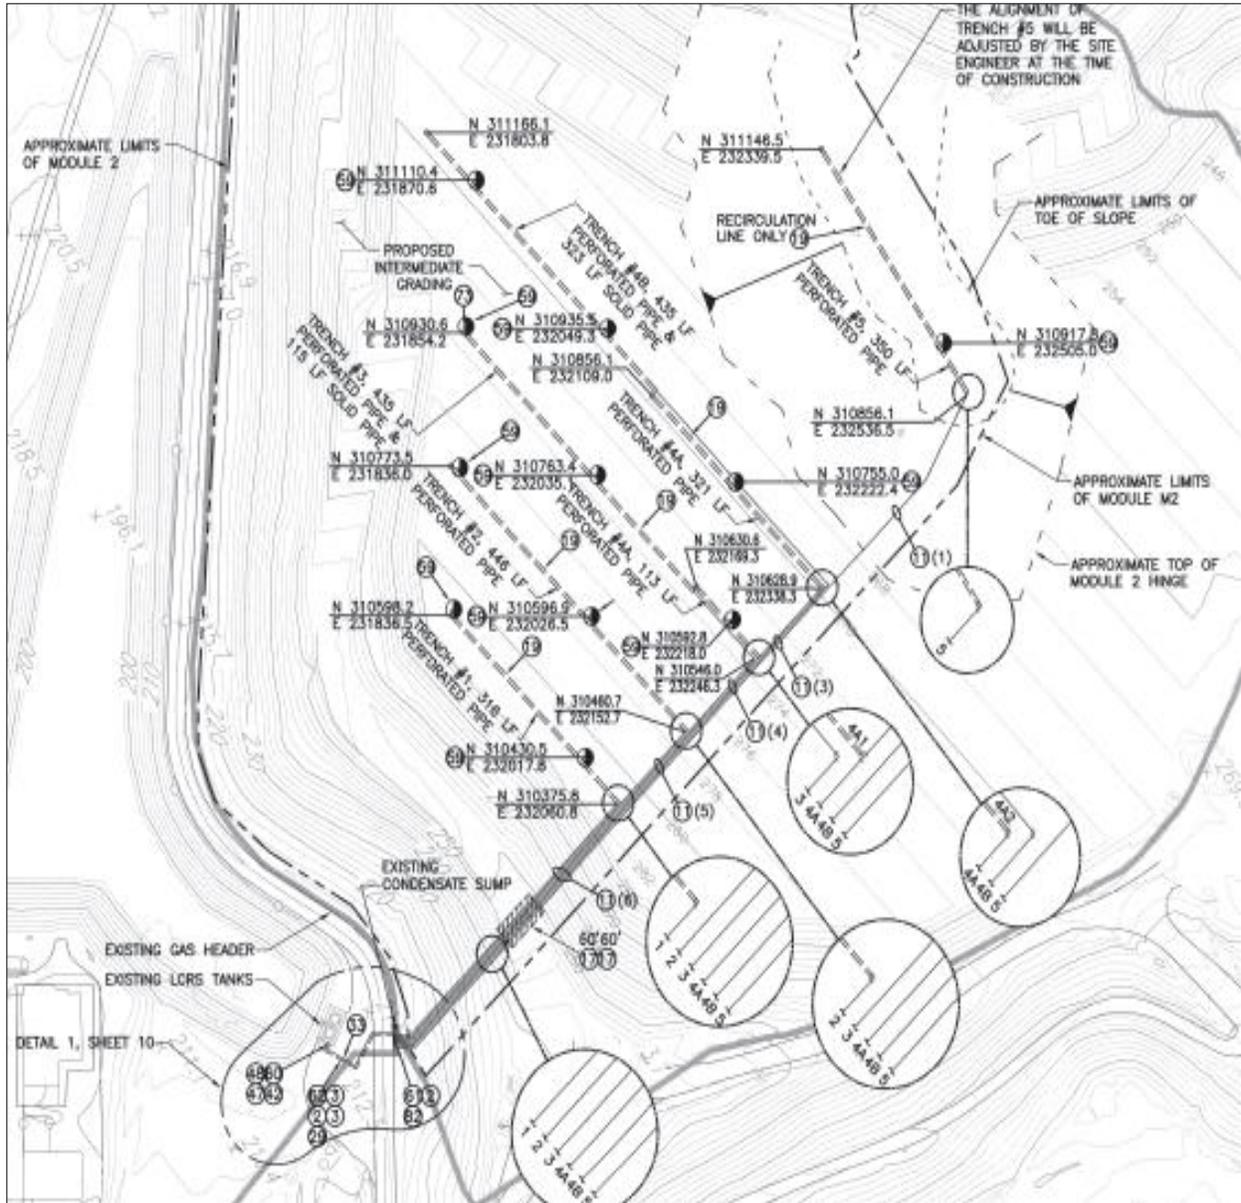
LFG and Leachate Recirculation Trench Plan
